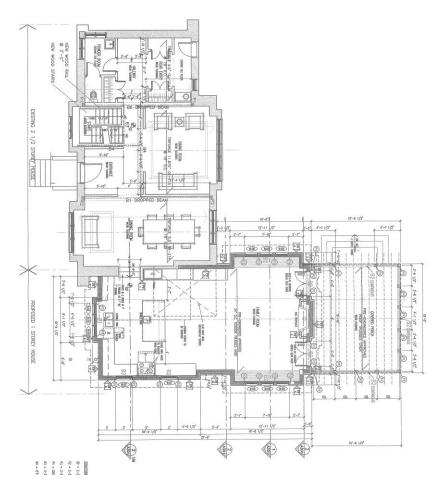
Ground floor plan of the existing and the one storey addition and deck. The addition is approximately the same size as the ground floor of the main house.
